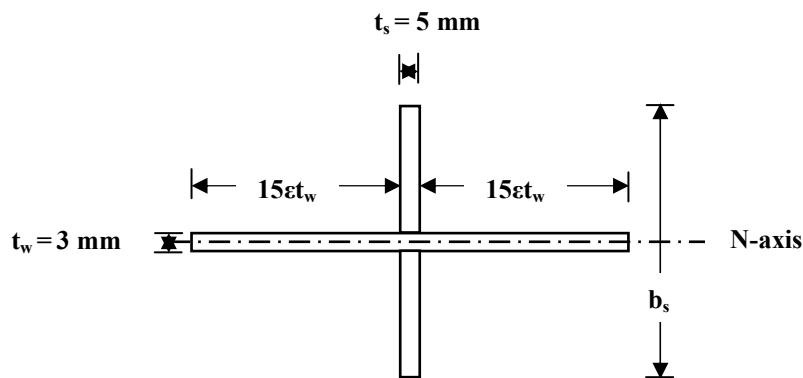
Required cross-section of load-bearing steel stiffeners for specimen B8
